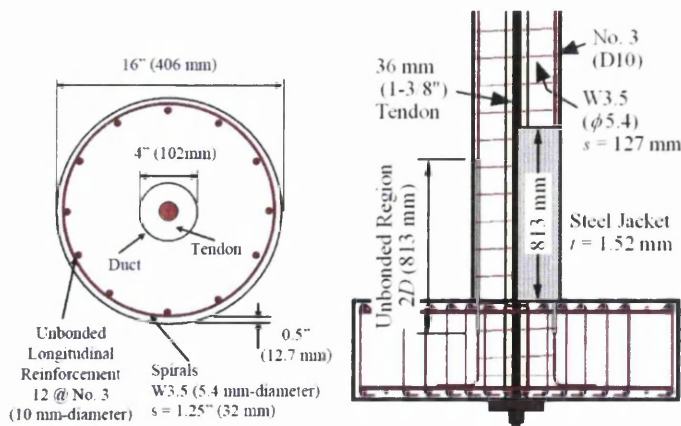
Cross section of all specimens and PRC-UJ specimen [51]
